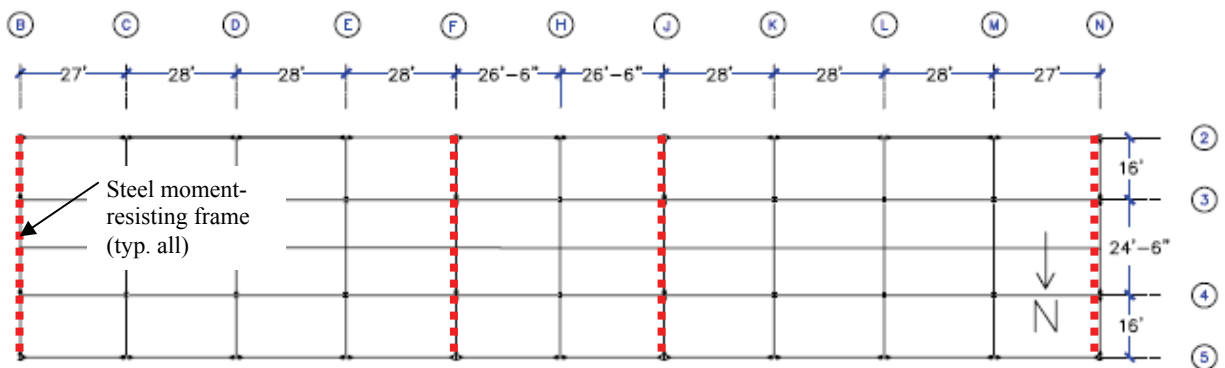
Second Floor Plan of WC70 Building Model taken from Yuan et al (2002)
